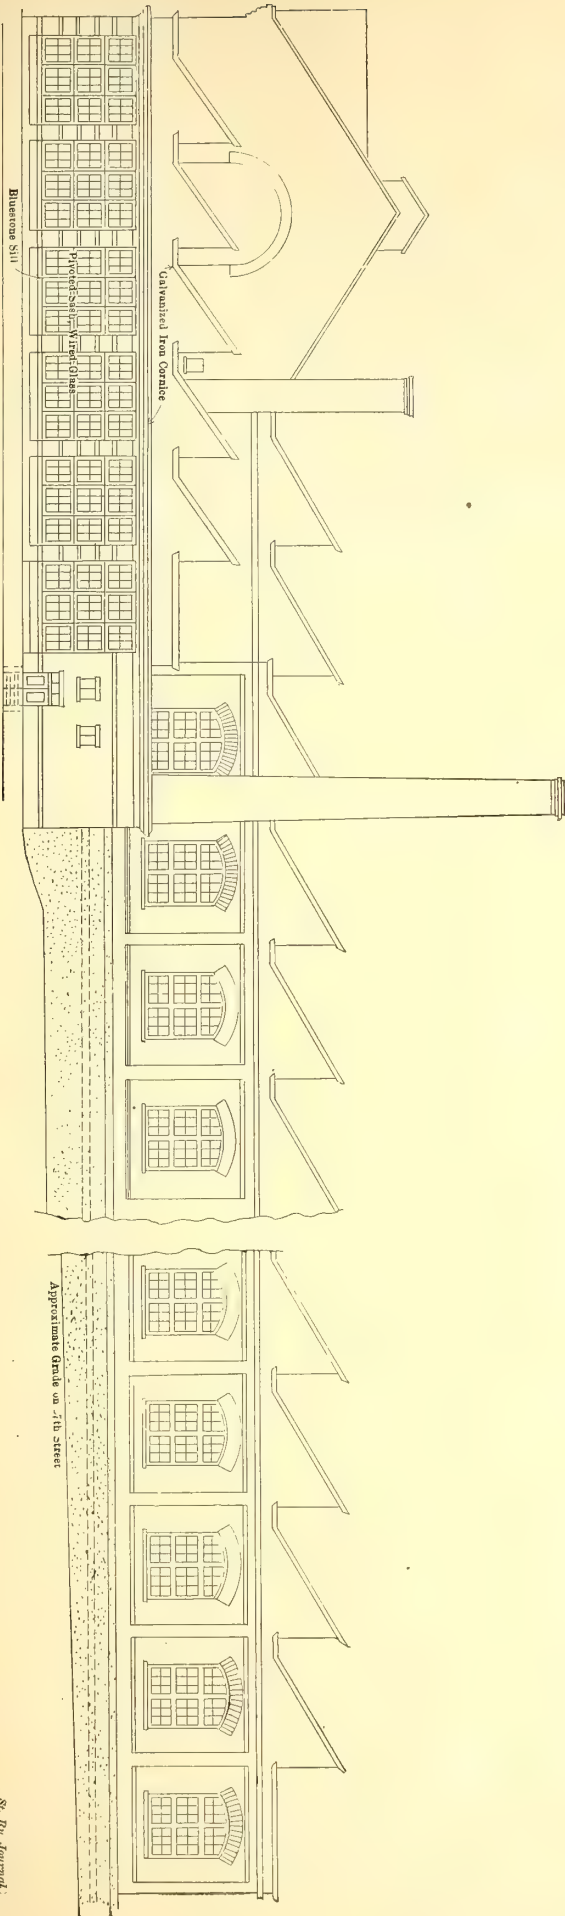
LONGITUDINAL ELEVATION OF THE THIRTY-SIXTH STREET INSTALLATION ON THE THIRTY-SEVENTH STREET SIDE, SHOWING MACHINE SHOPS (OFFICE BUILDING IN BACKGROUND), STEAM-HEATING PLANT AND THE INSPECTION STRUCTURE
